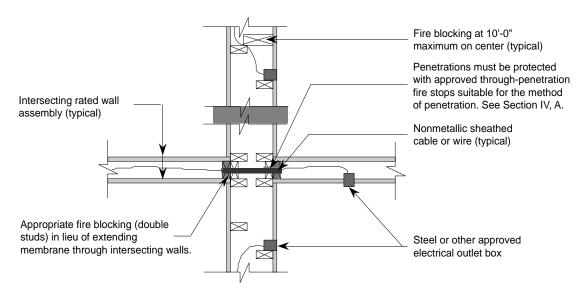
Wood or steel frame one- or two-hour fire-resistive separation wall at intersection with nonrated walls (plan view)
